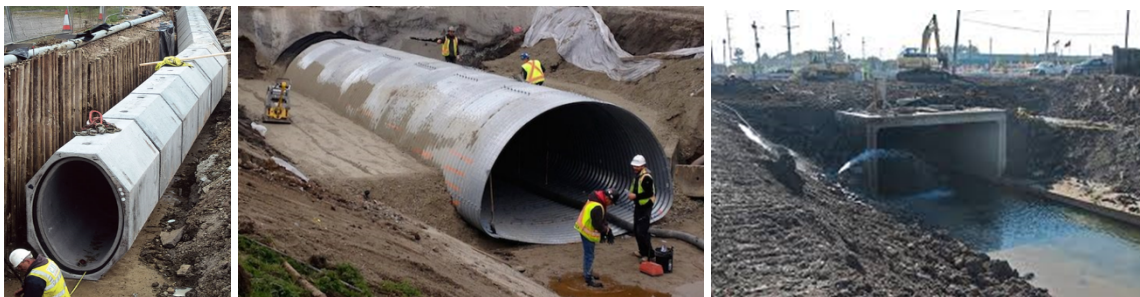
Pipes and pipe segments. (Source: *ISTT*.)
